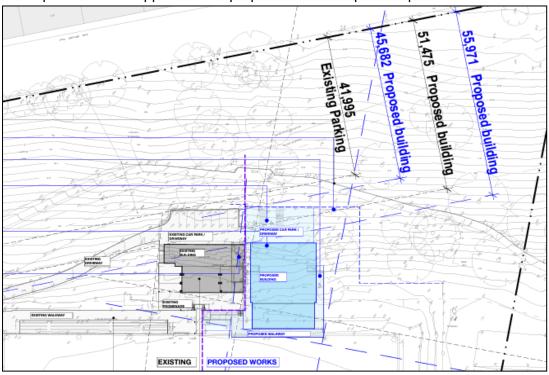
Approved site plan showing the location of the new building and grandstand under DA-1321/2021 (coloured blue).
